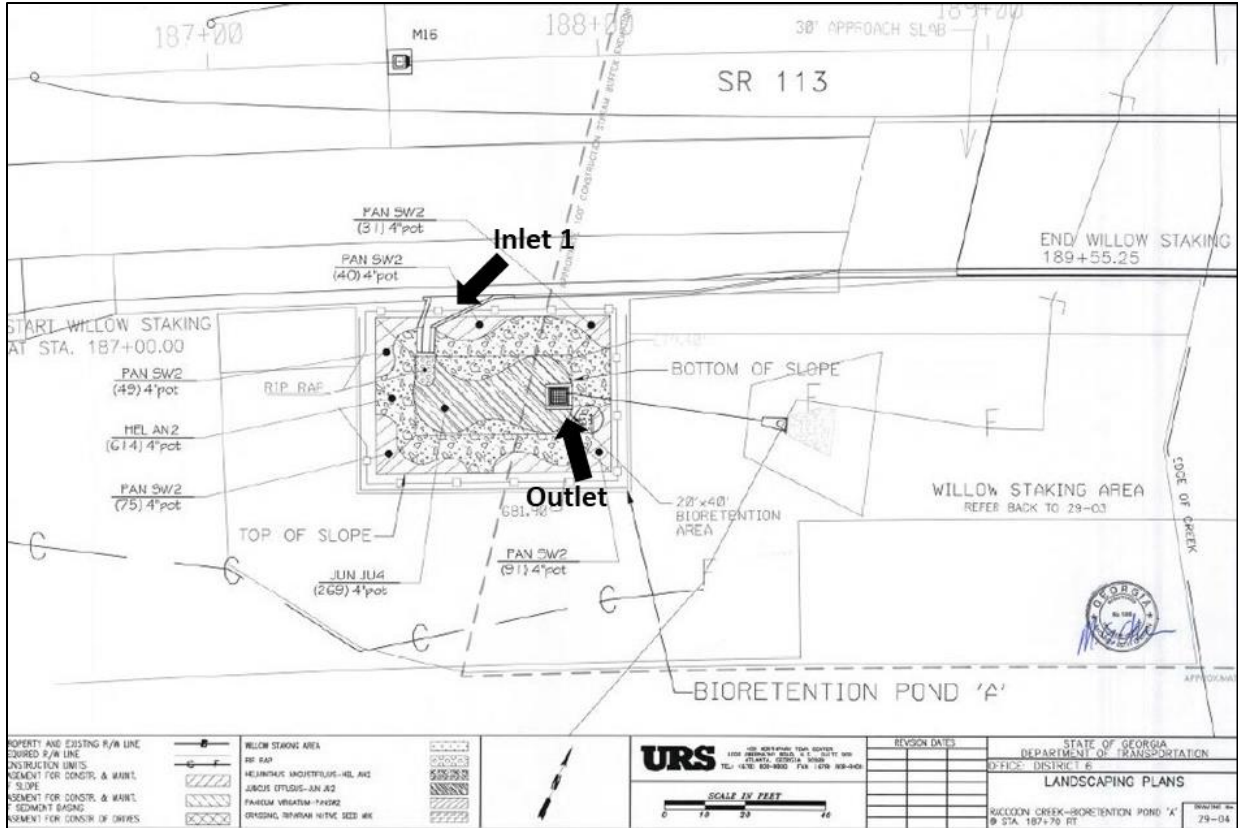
Diagram. Sample Locations at the Raccoon Creek Bioretention Basin.
